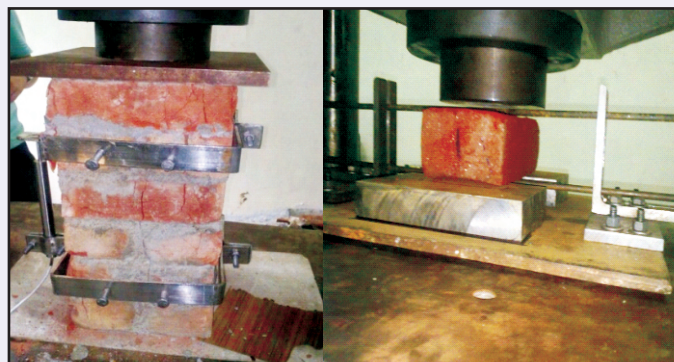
Testing of Bricks for splitting tensile strength test as per ASTM standards
